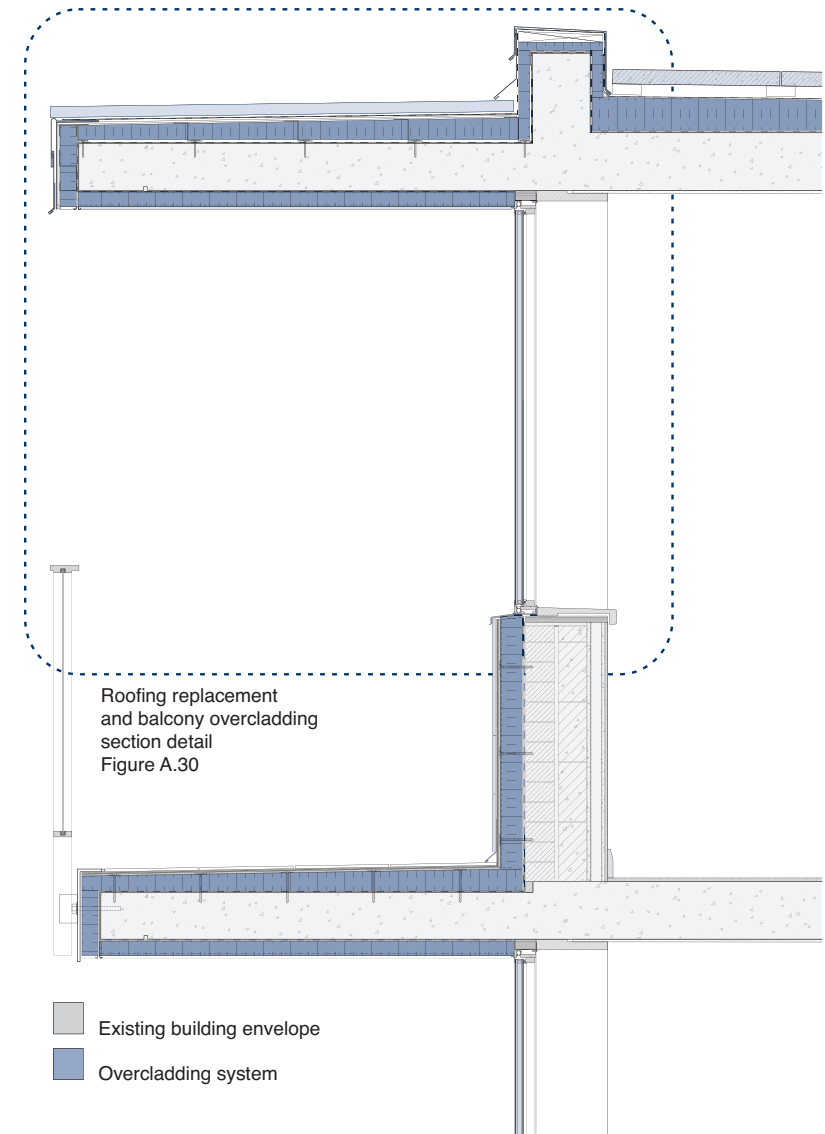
Section view of a roofing replacement and balcony overcladding assembly with corresponding detail drawing denoted.
